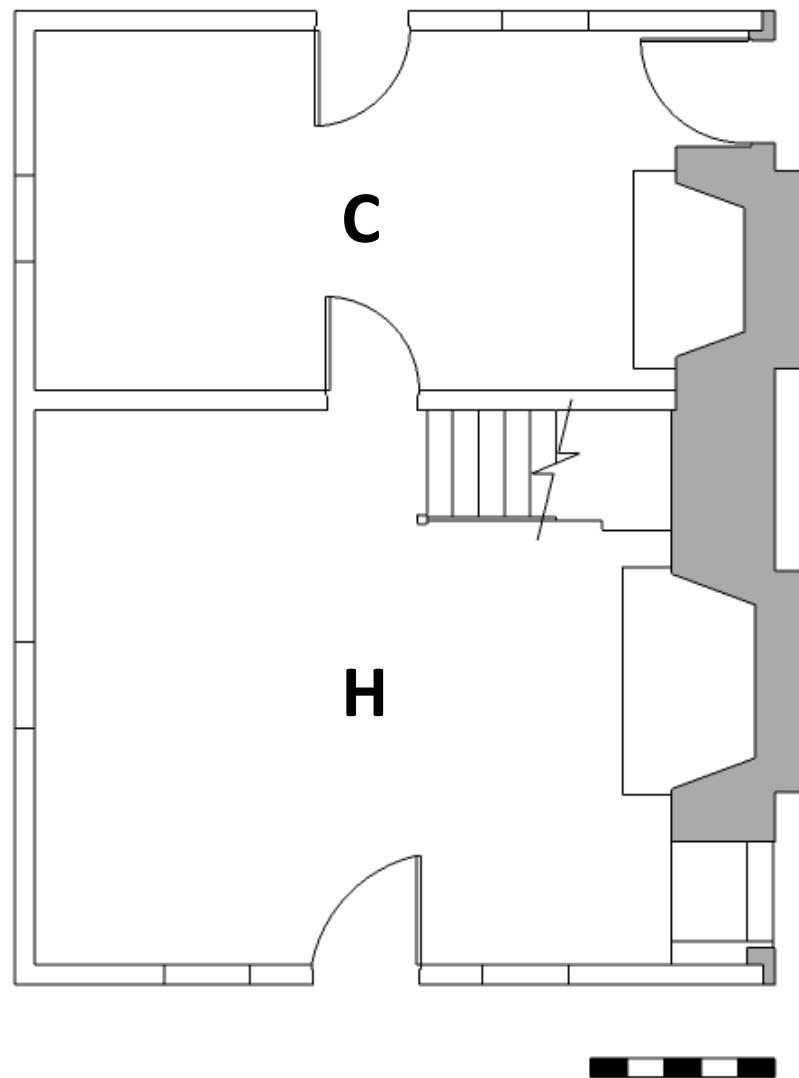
Ground-floor plan of Long Place, Accomack County, built c. 1792, a double-pile hall-chamber house. Drawing by author.
